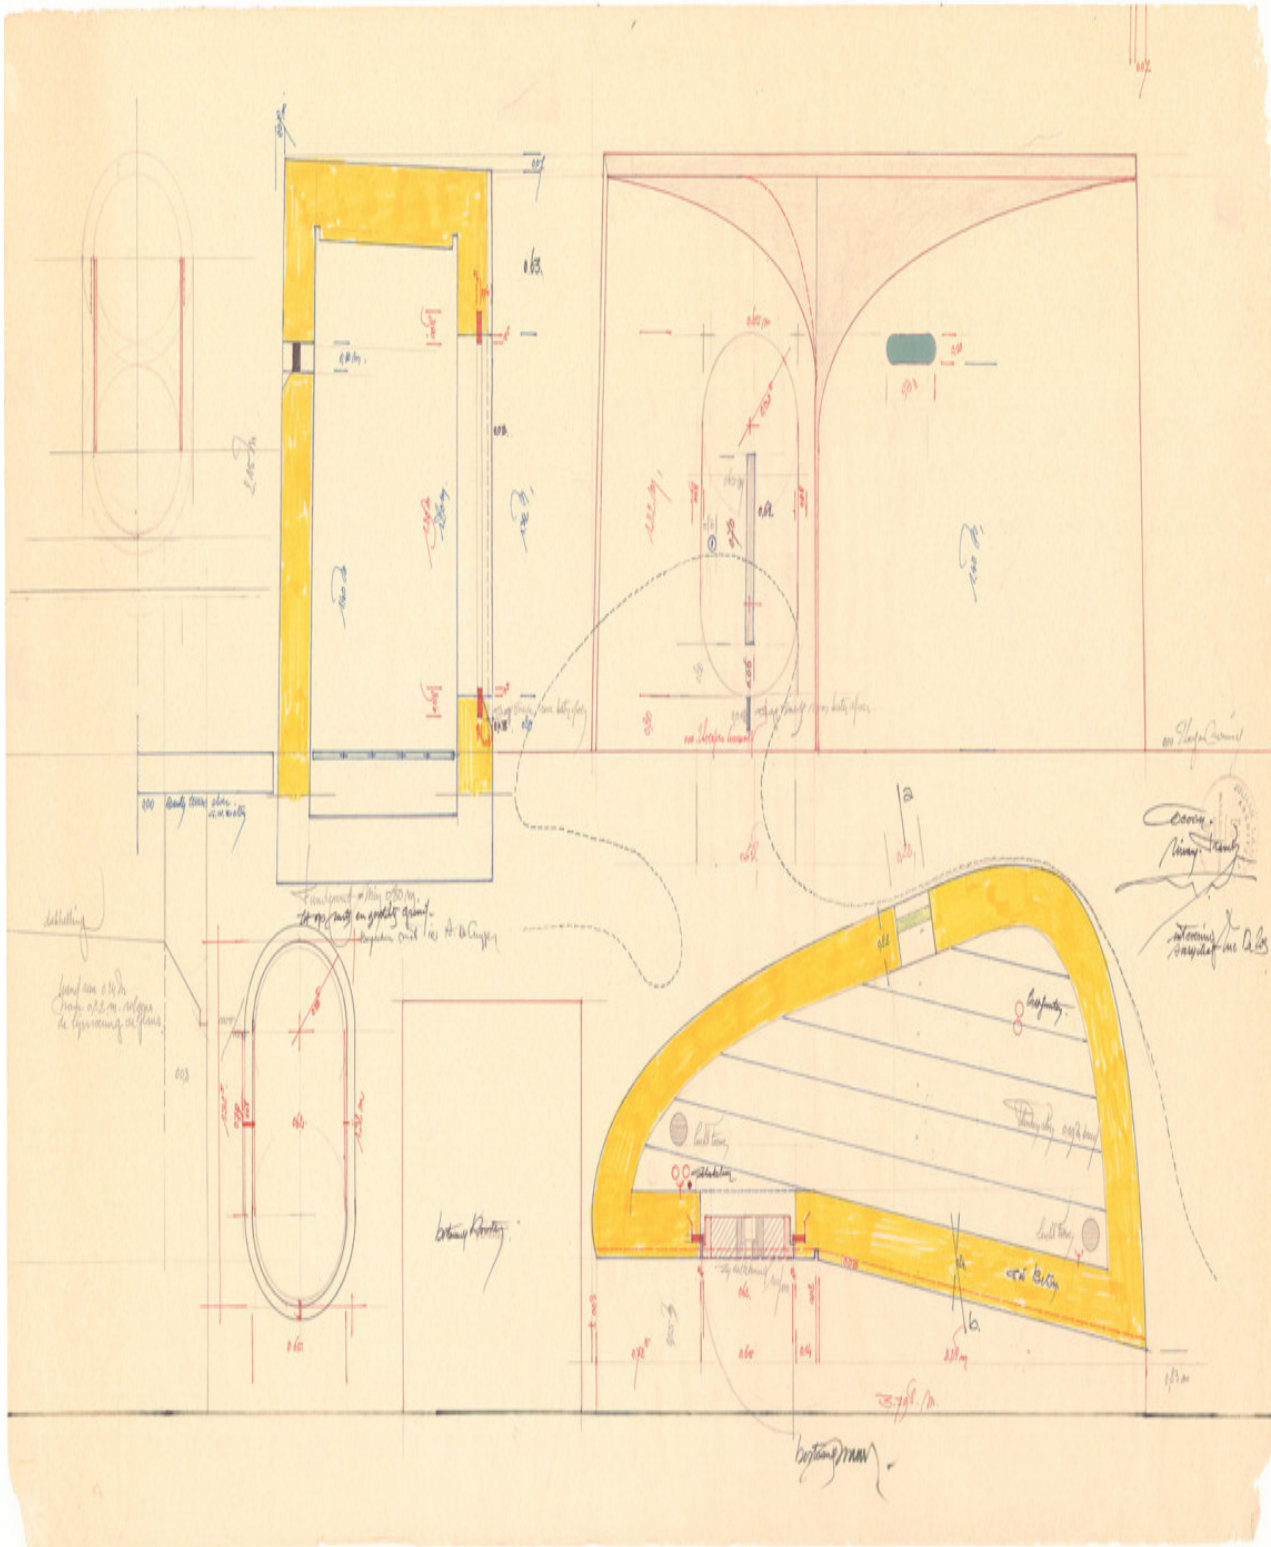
House Velghe-Vanderlinden : plan, section, elevation, details / pencil, ballpoint, fountain pen, markers on paper, scale 1/10, size original drawings 88 x 56 cm © Juliaan Lampens Foundation
